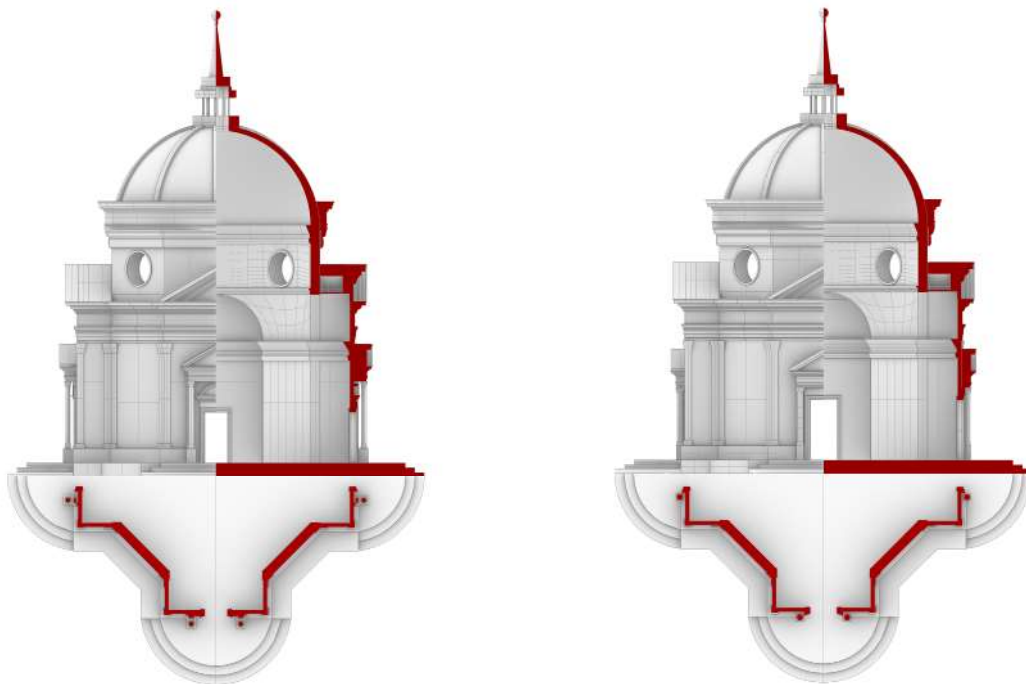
Plan, section and elevation of the first variant (1:500) Fig. 37 - Plan, section and elevation of the second variant (1:500)
